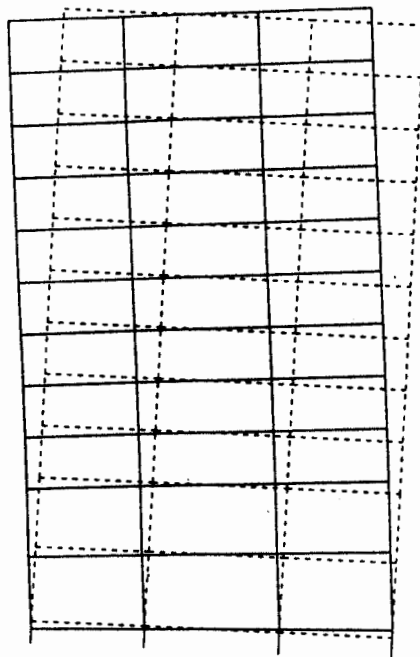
Building #3 - 9 Story Government Office Building, San Bruno
